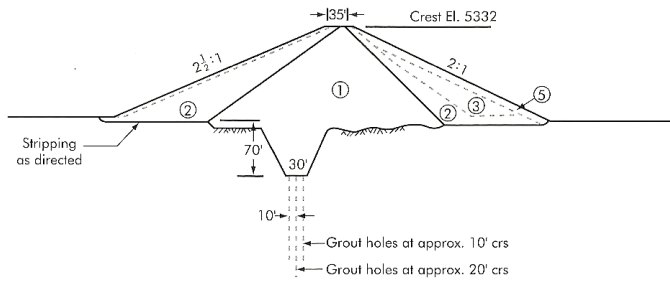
Schematic diagram of the Teton Dam: Section with a deep cut-off trench at failure position in right abutment, [6].
